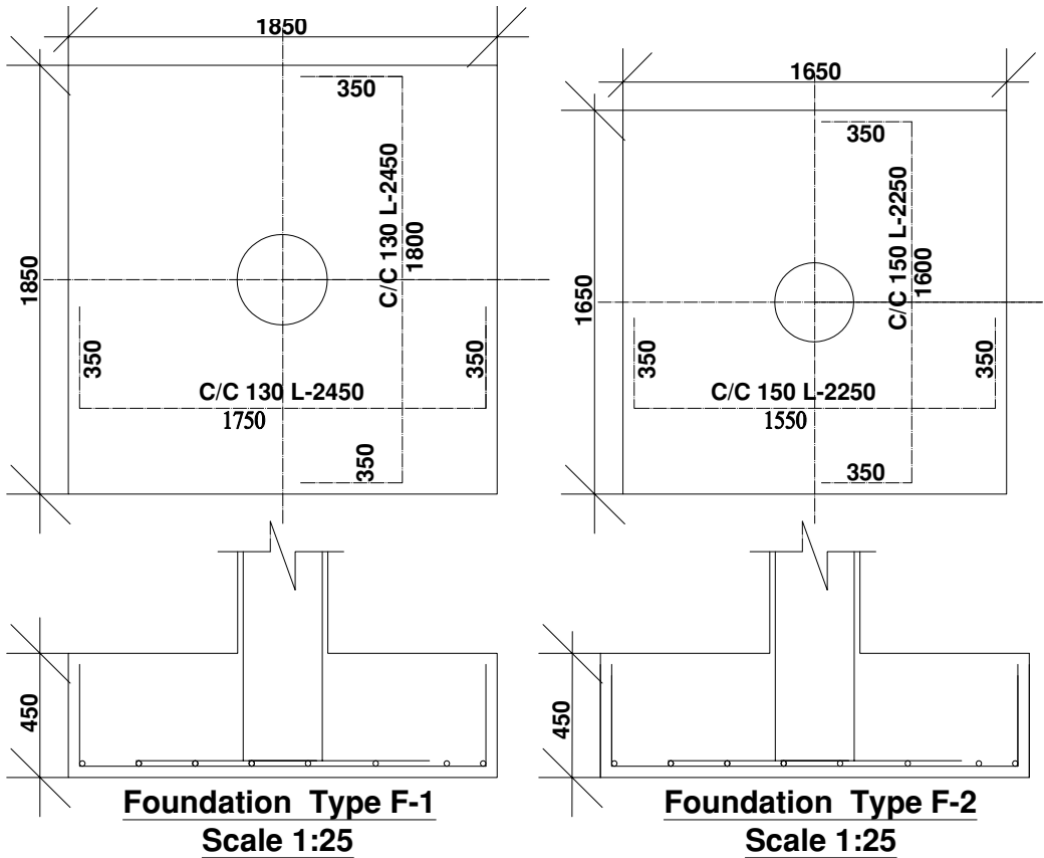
Sample foundation detailing for G+2 building with C-40 concrete
